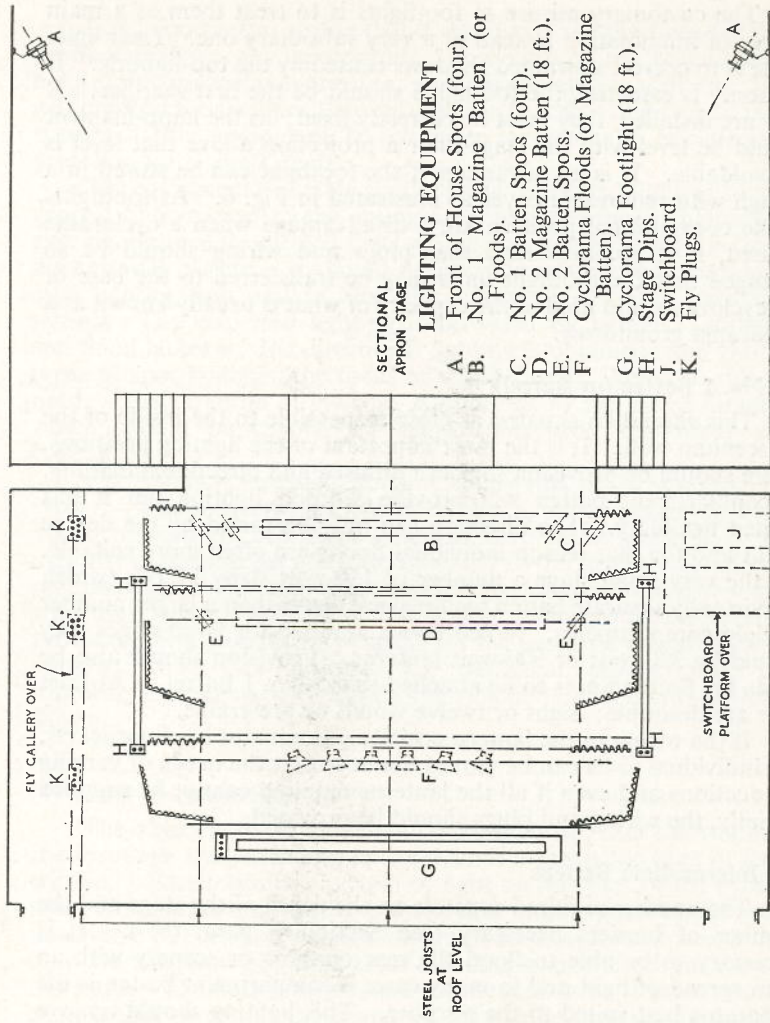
(a). Typical layout (plan) for stage of suggested minimum dimensions (see below for section).
